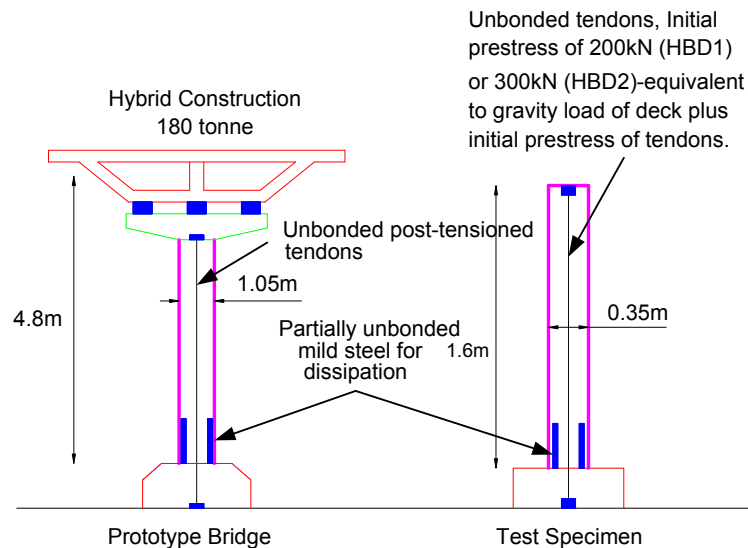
Vertically Post-Tensioned Bridge Pier Column [after (Palermo et al. 2007)]
